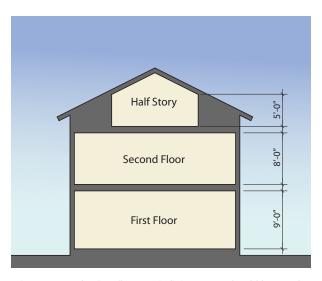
The first floor, main living area, should be emphasized by a larger floor to floor height.
